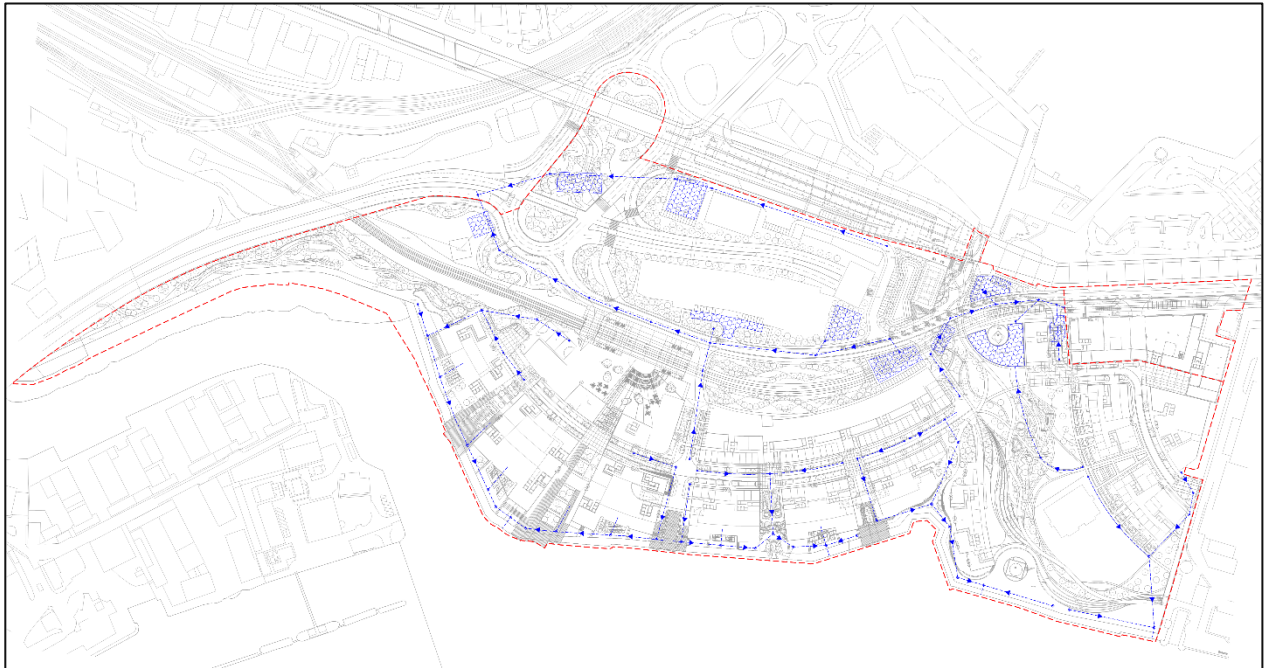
Plan showing the overall proposed surface water drainage strategy
